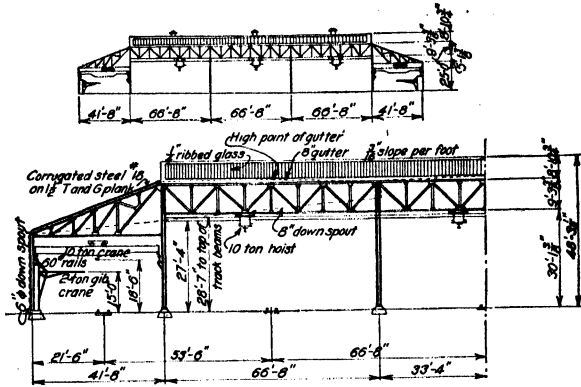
Structural steel fabricating shop. Transverse section through punching and assembling departments.
